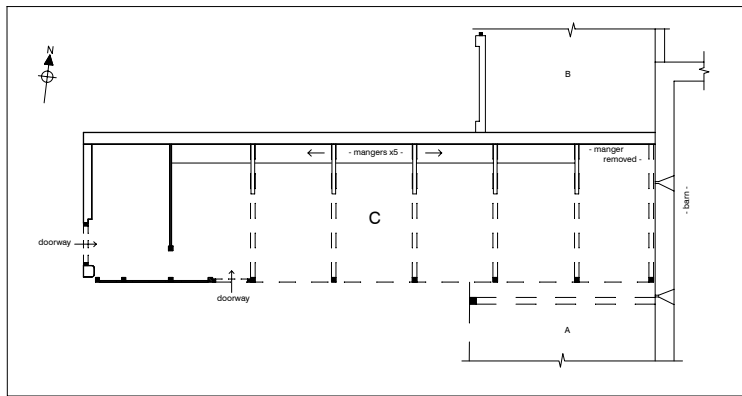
Plan of Stable 1 (Building C). Scale 1:100
